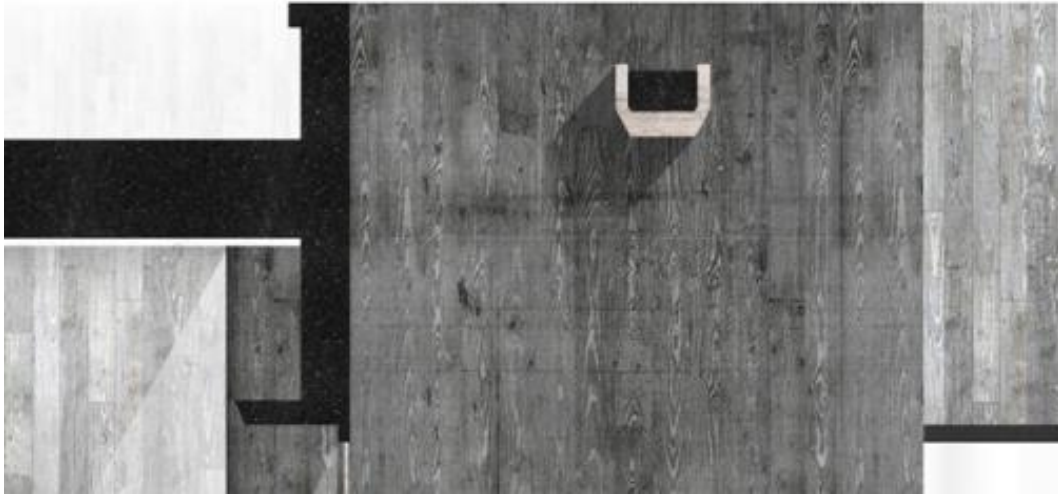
Illustration of white exposed concrete water spout extends from the facade of the inner courtyard (above) and water spouts made out of Ankara stone attached to the walls retaining upper soil of the inner courtyard at the Faculty of Architecture building. (Produced by the Author)
